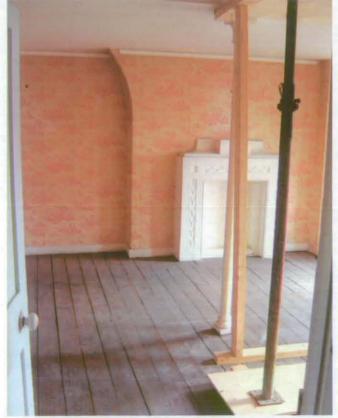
Fire surround in 3F5 and steel column inserted, probably after the north wall of this room was moved northwards; looking east. The steel column has been reinforced recently with acrow props (A J Browne, Architects)
